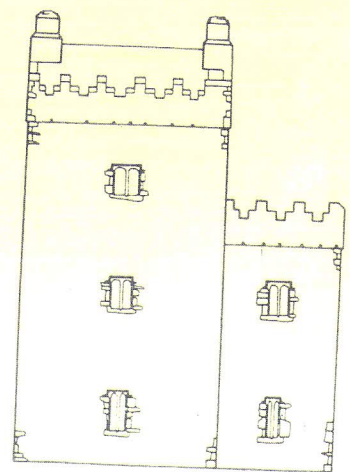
Elevation of the castle at Baltinglass Abbey (after Stalley 1987)
